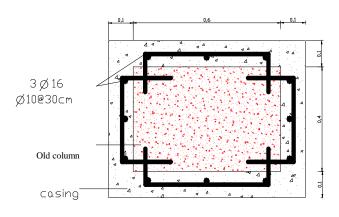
Treatment of damage columns_(simple) by using a casing of concrete
